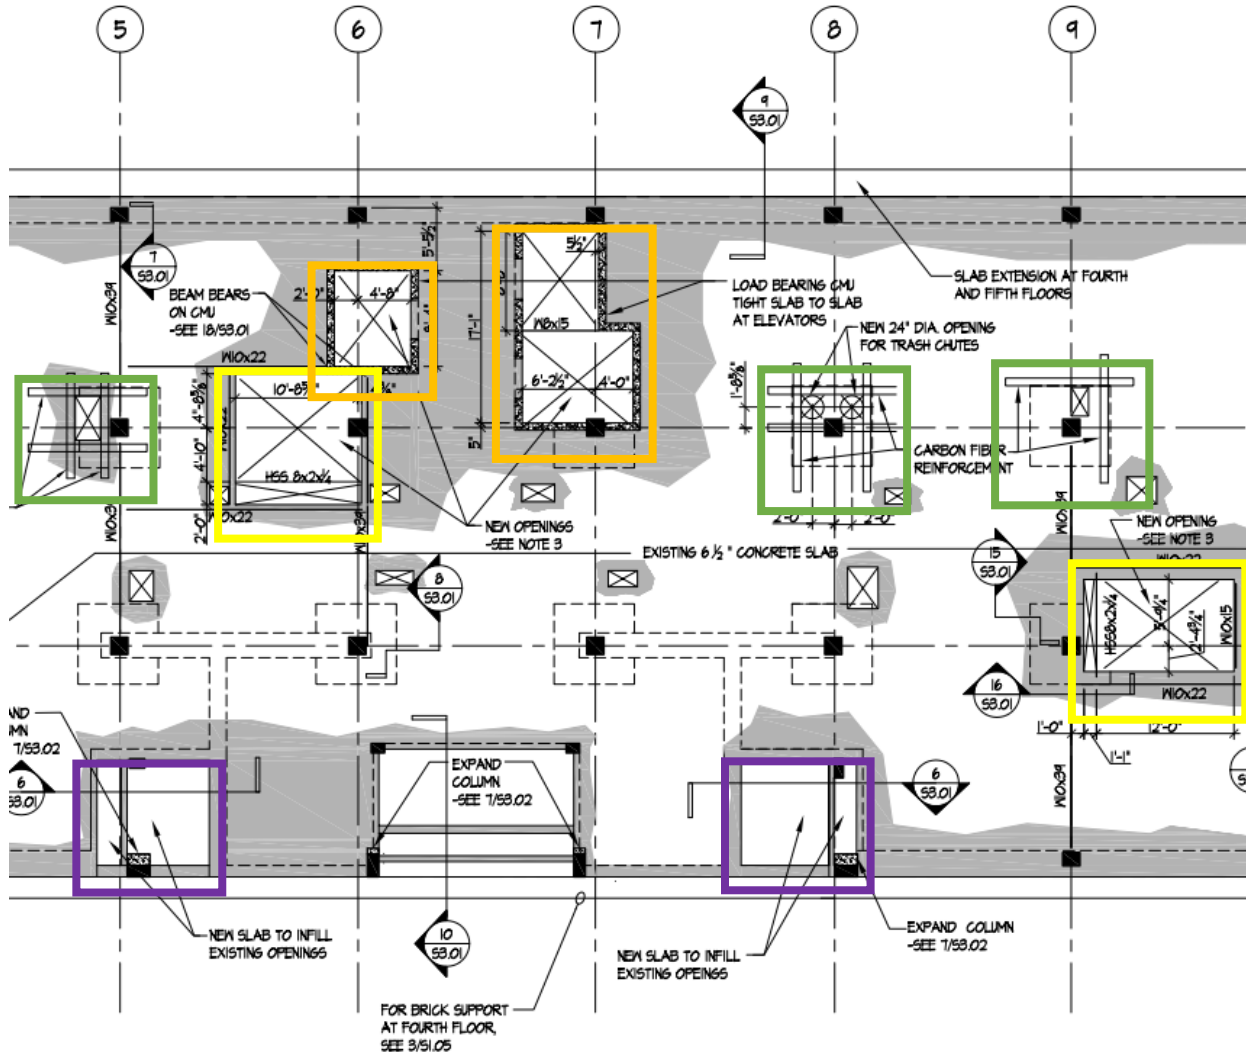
Portion of Typical Floor Plan Shown where Modifications to slab and layout occur in original building's slabs, S1.05
